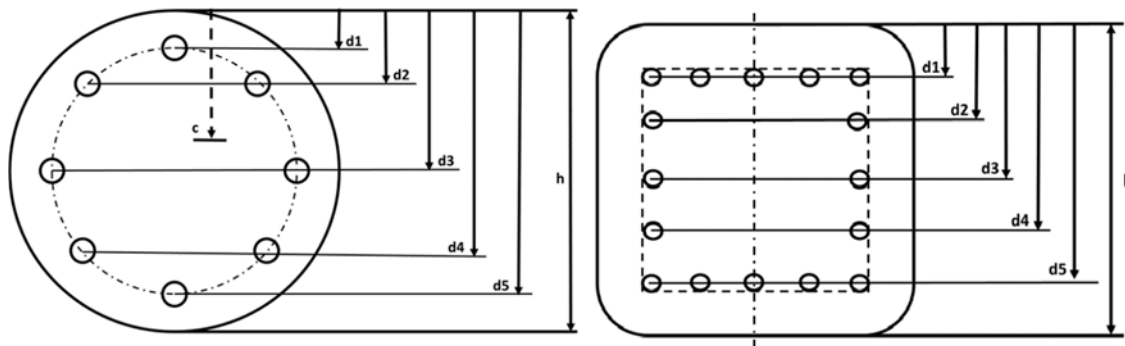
Circular and Rectangular Cross Sections for Prestressed Concrete.
